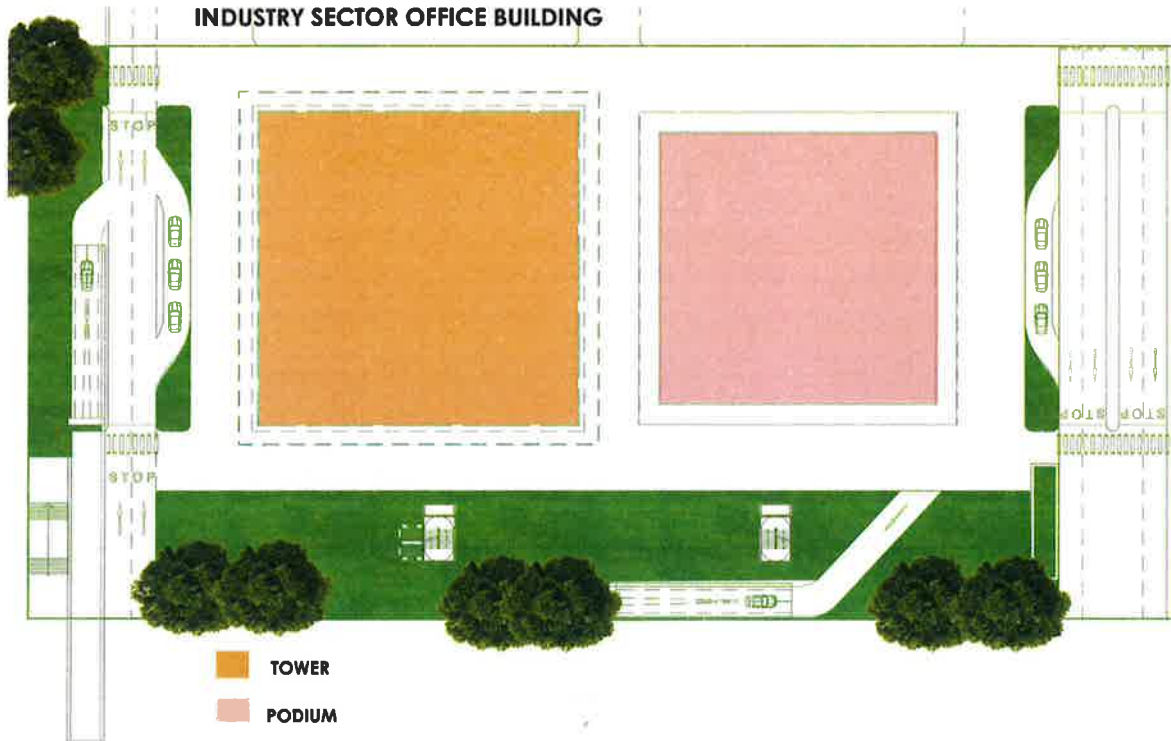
shows the typical layout plan of Industry Sector Office Complex
